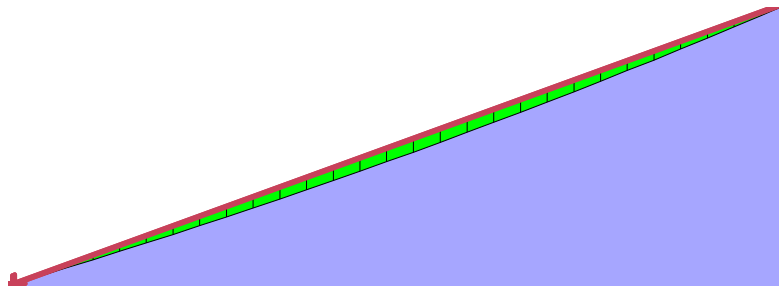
Potential failure surface during first stage construction (Detail D)
